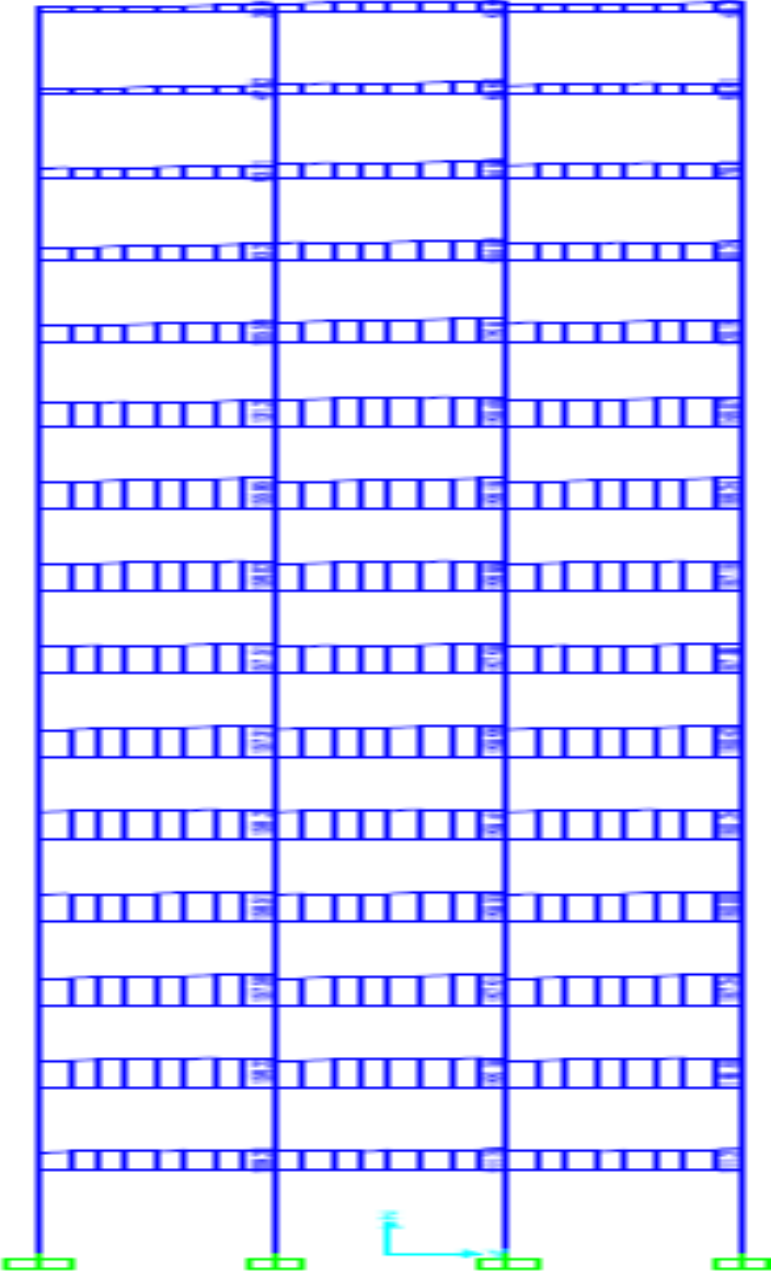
SHEAR FORCE FOR THE 15 STOREY STEEL FRAME BUILDING.
